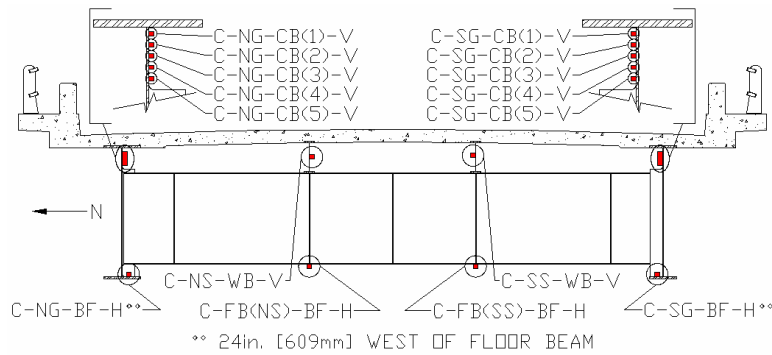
FOS layout of the FCB SHM system in the US30 bridge.
